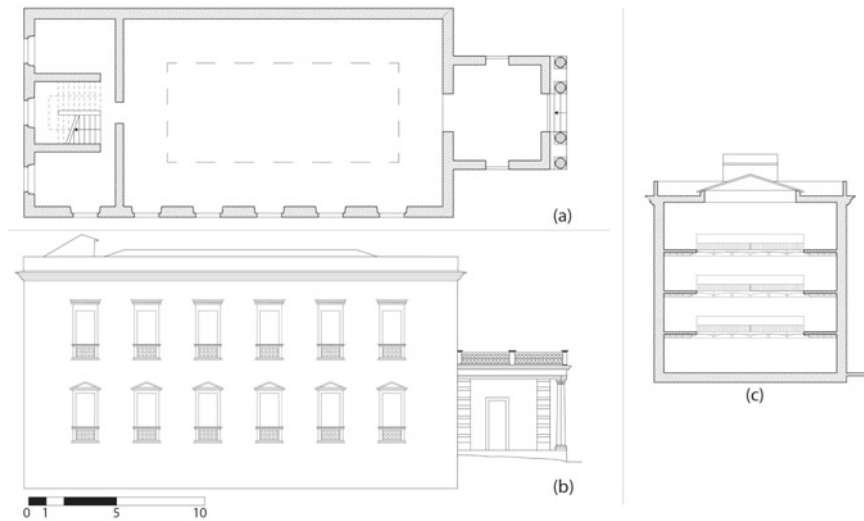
Villa Di Negro: a plan; b facade; c section (Drawing: A. Meloni)
